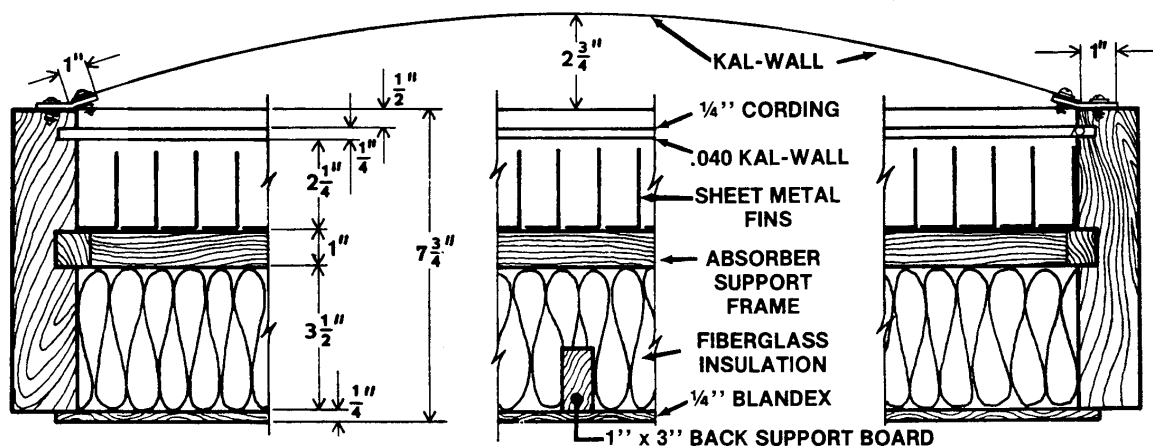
CROSS-SECTION OF AIR COLLECTOR
